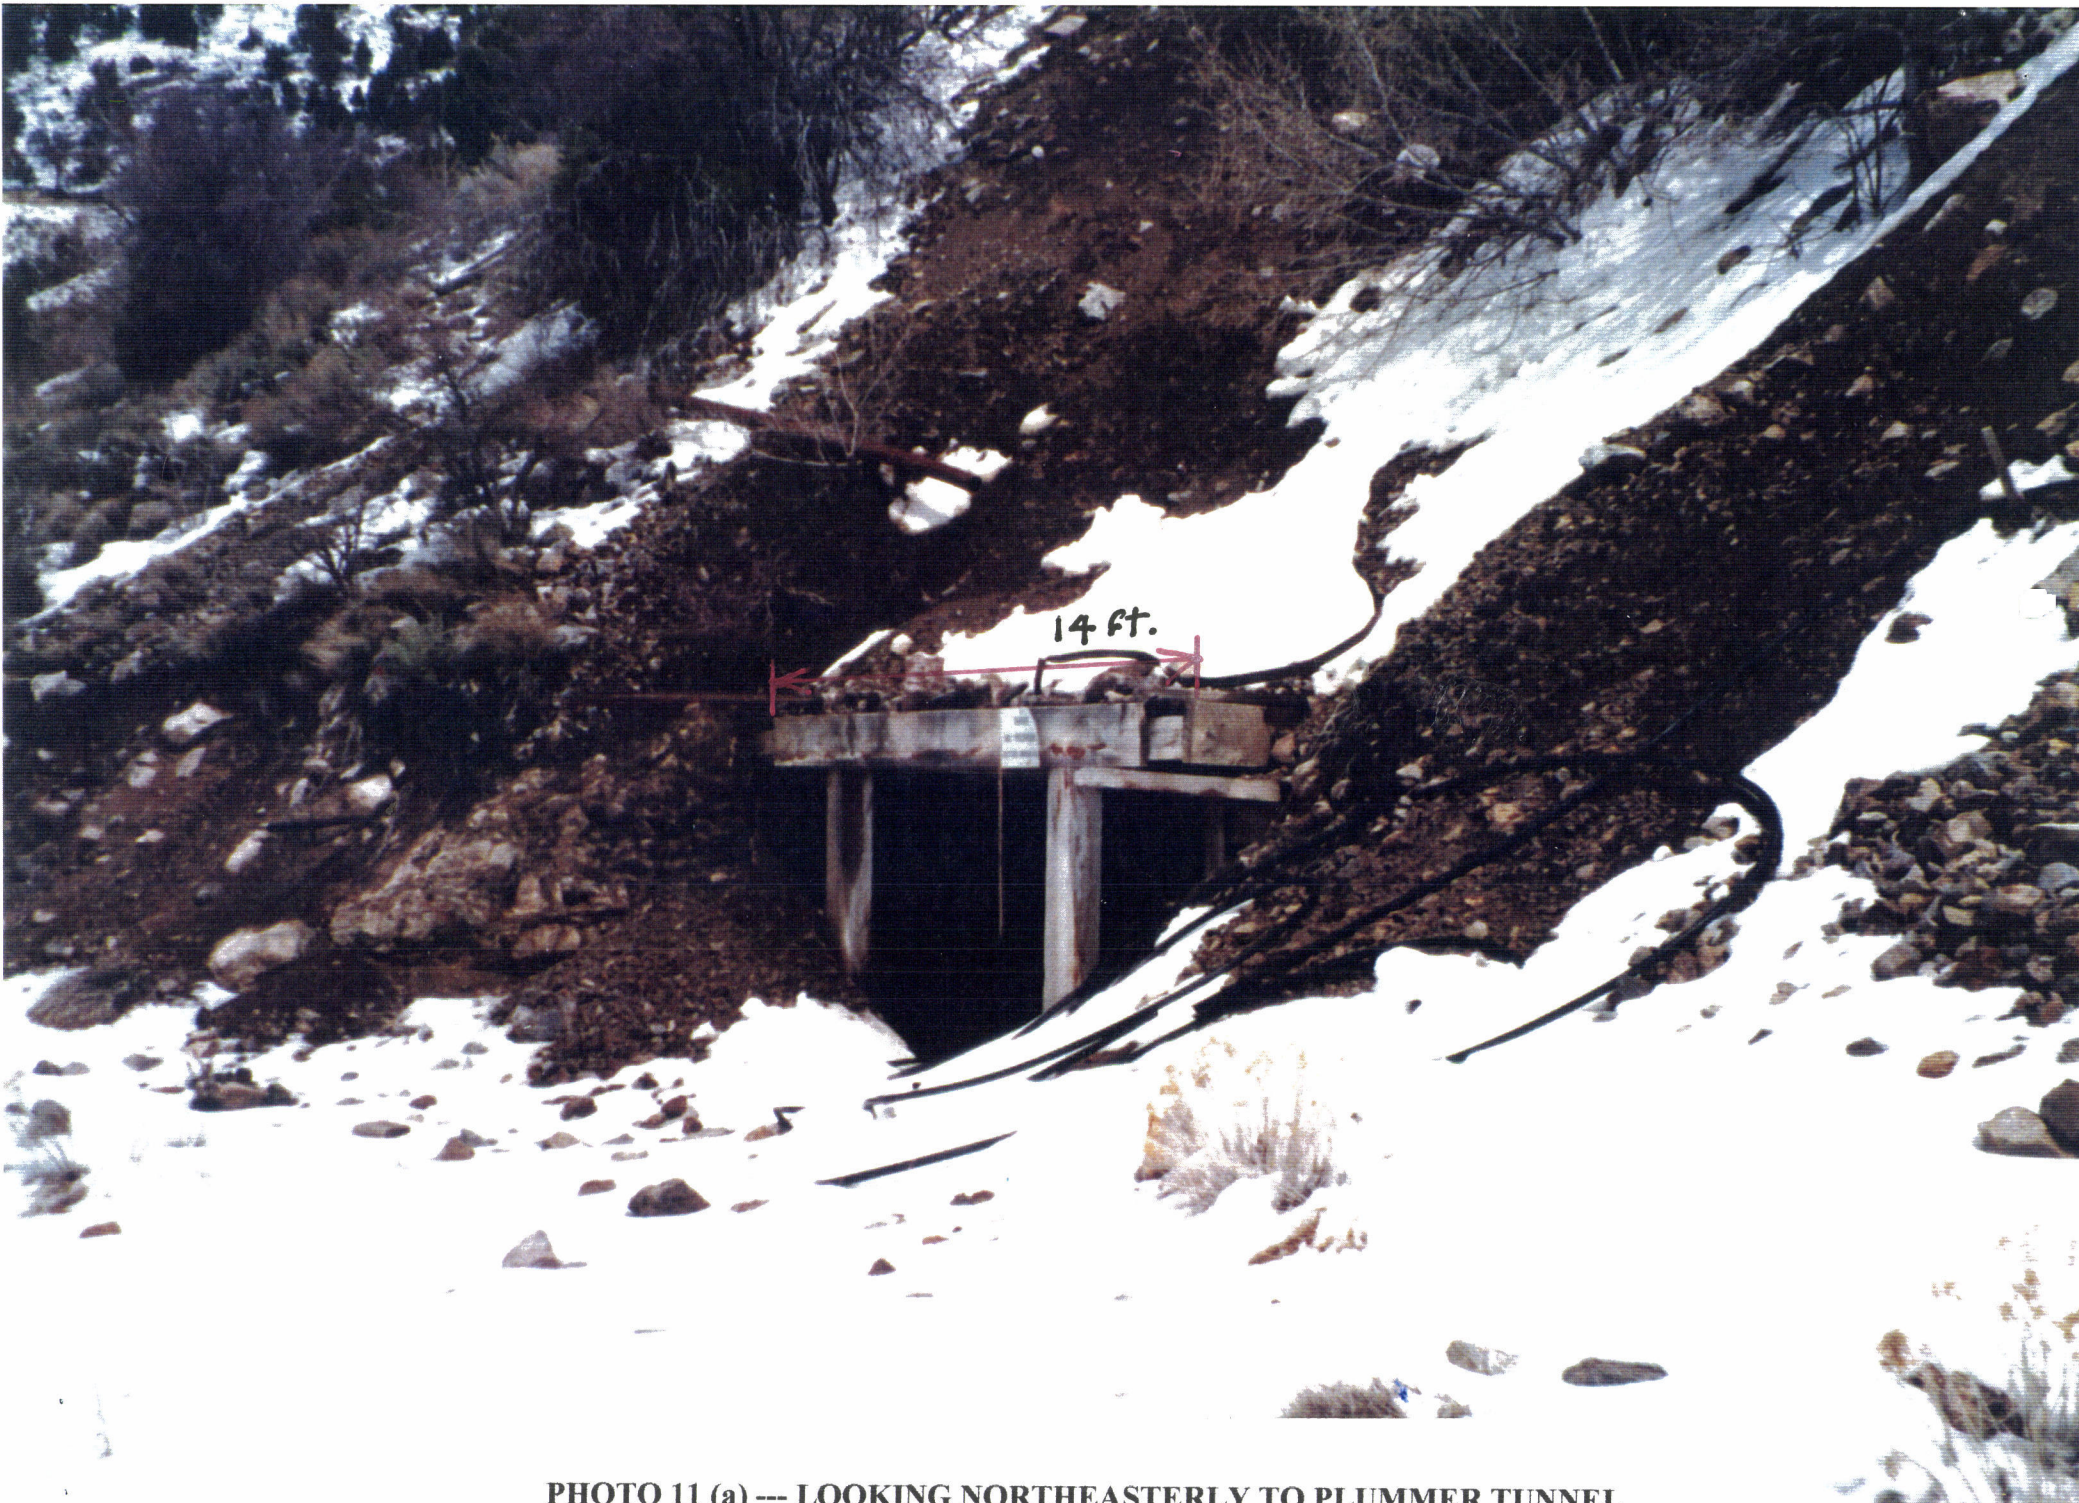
(a) --- LOOKING NORTHEASTERLY TO PLUMMER TUNNEL PORTAL.
